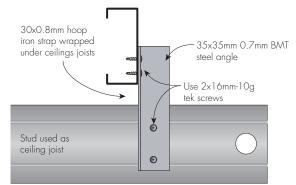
Ceiling Continuous Joist to Hoop Iron Strap
